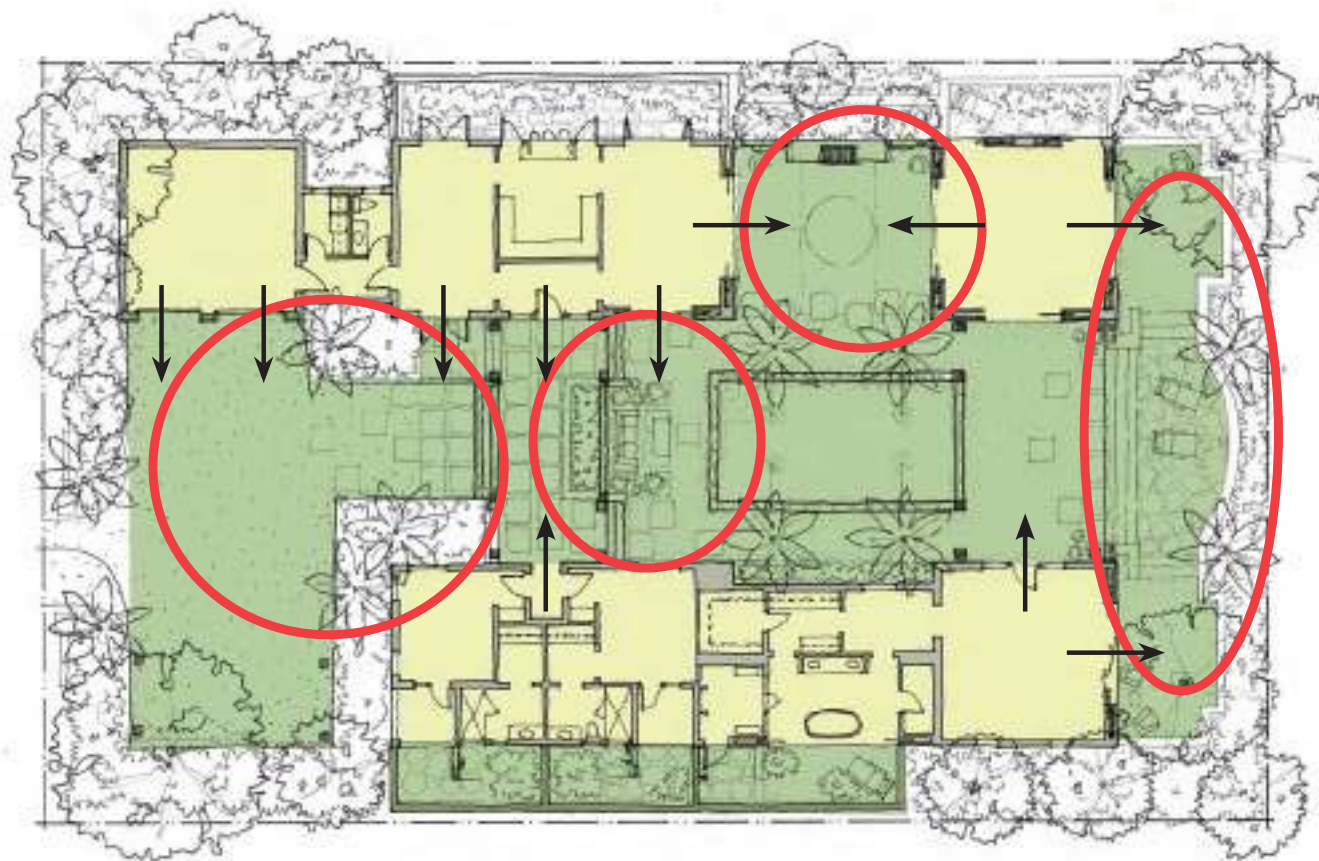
☒ e Outdoor Room - “Home” should be thought of as the entire dwelling place, inside and out.
